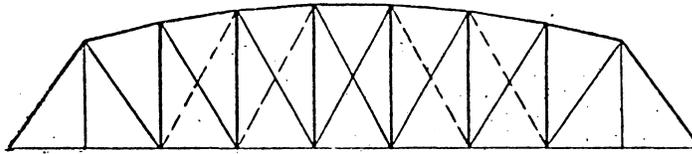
Parker truss, really a Pratt truss having a polygonal top chord whose slope changes at each panel point. (From Bridge Engineering, James A. L. Waddell, p. 469.)
